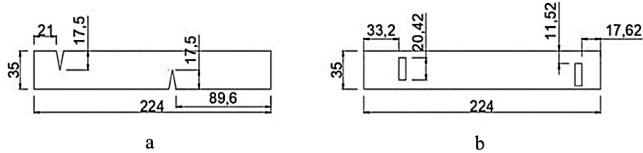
Types and geometric parameters of models: a - sample with a sawn crack; b - sample with a built-in crack
